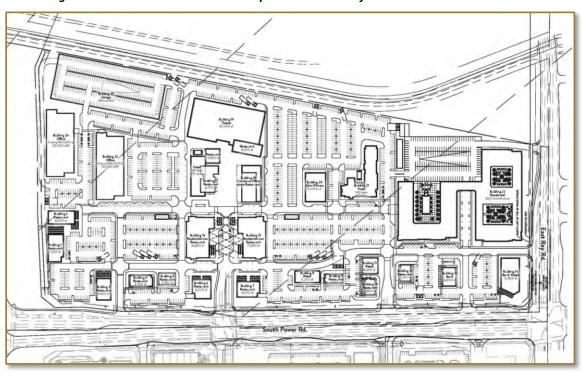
Alternative Site Plan Example in General Conformance with Site Plan Review
